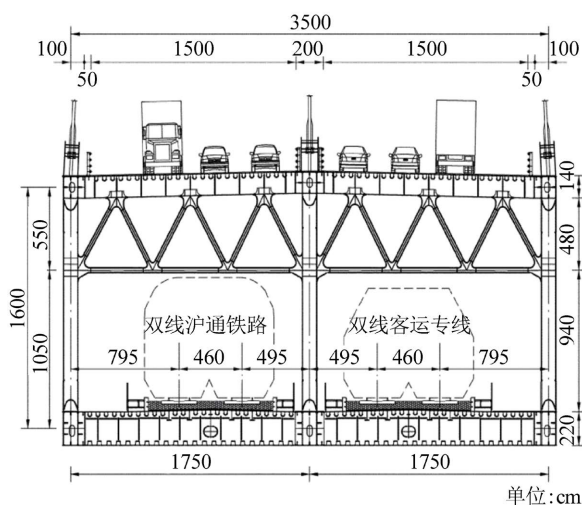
Cross section of Shanghai-Suzhou-Nantong Yangtze River Bridge
